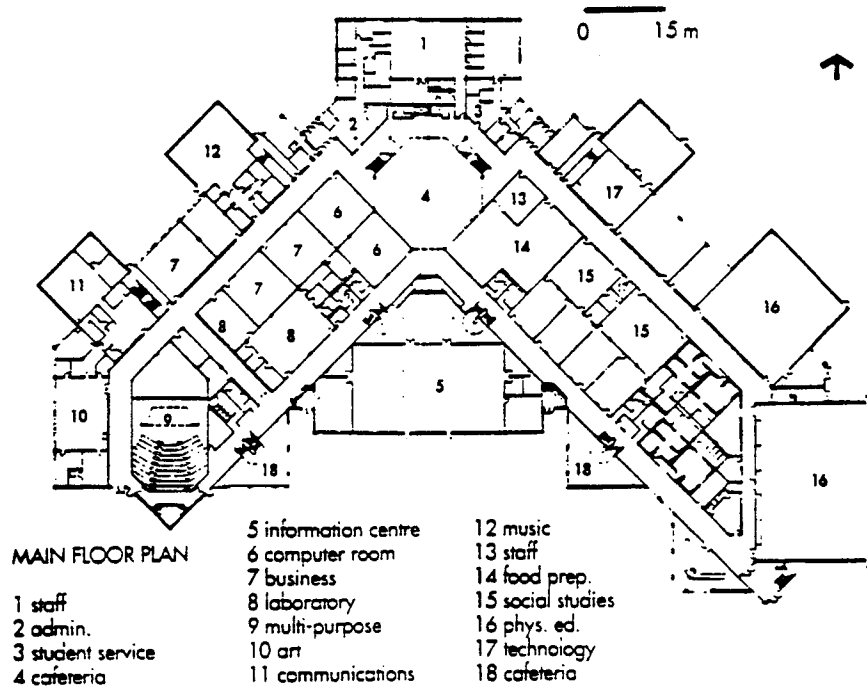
Plan of the main floor at Lester B. Pearson High School.
